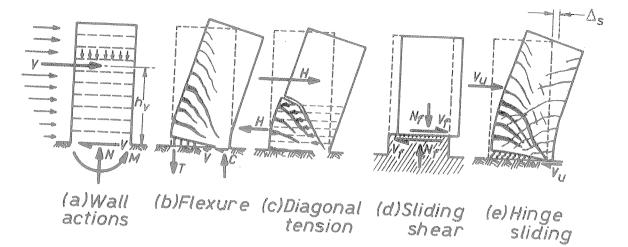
Possible Failure Modes in Cantilever Shear Walls
